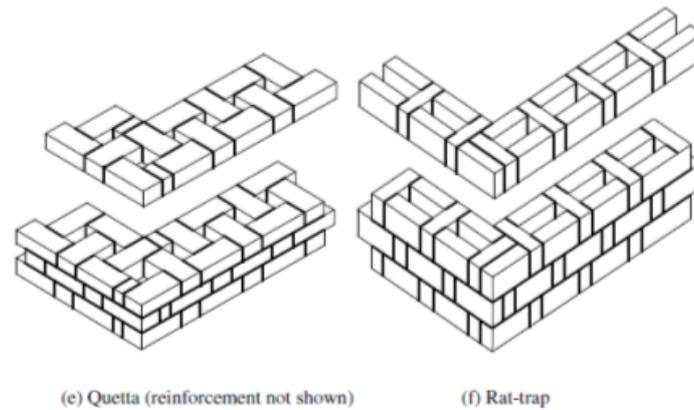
Brick Masonry Bond with Cavities [Hendry & Khalaf, 2001, page 69]
